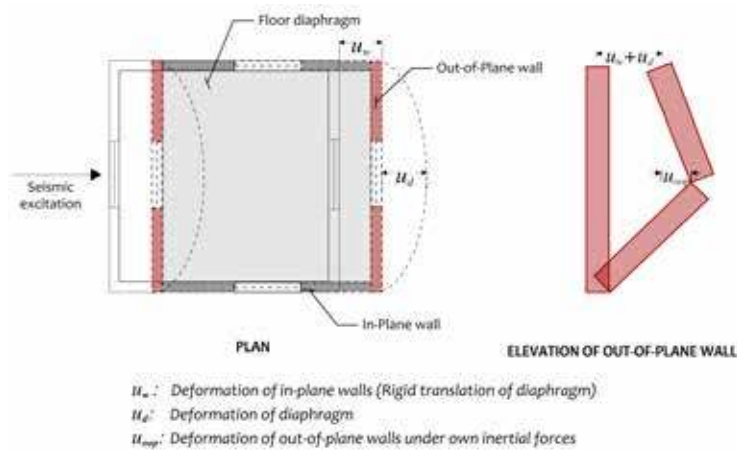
Deformation of floor diaphragms and out-of-plane walls
